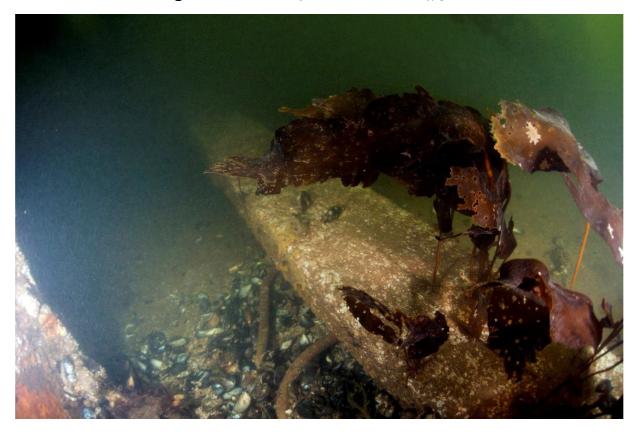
Helensburgh Pier – Pile 05 (scale = 58.5 x 6.0 cm)
